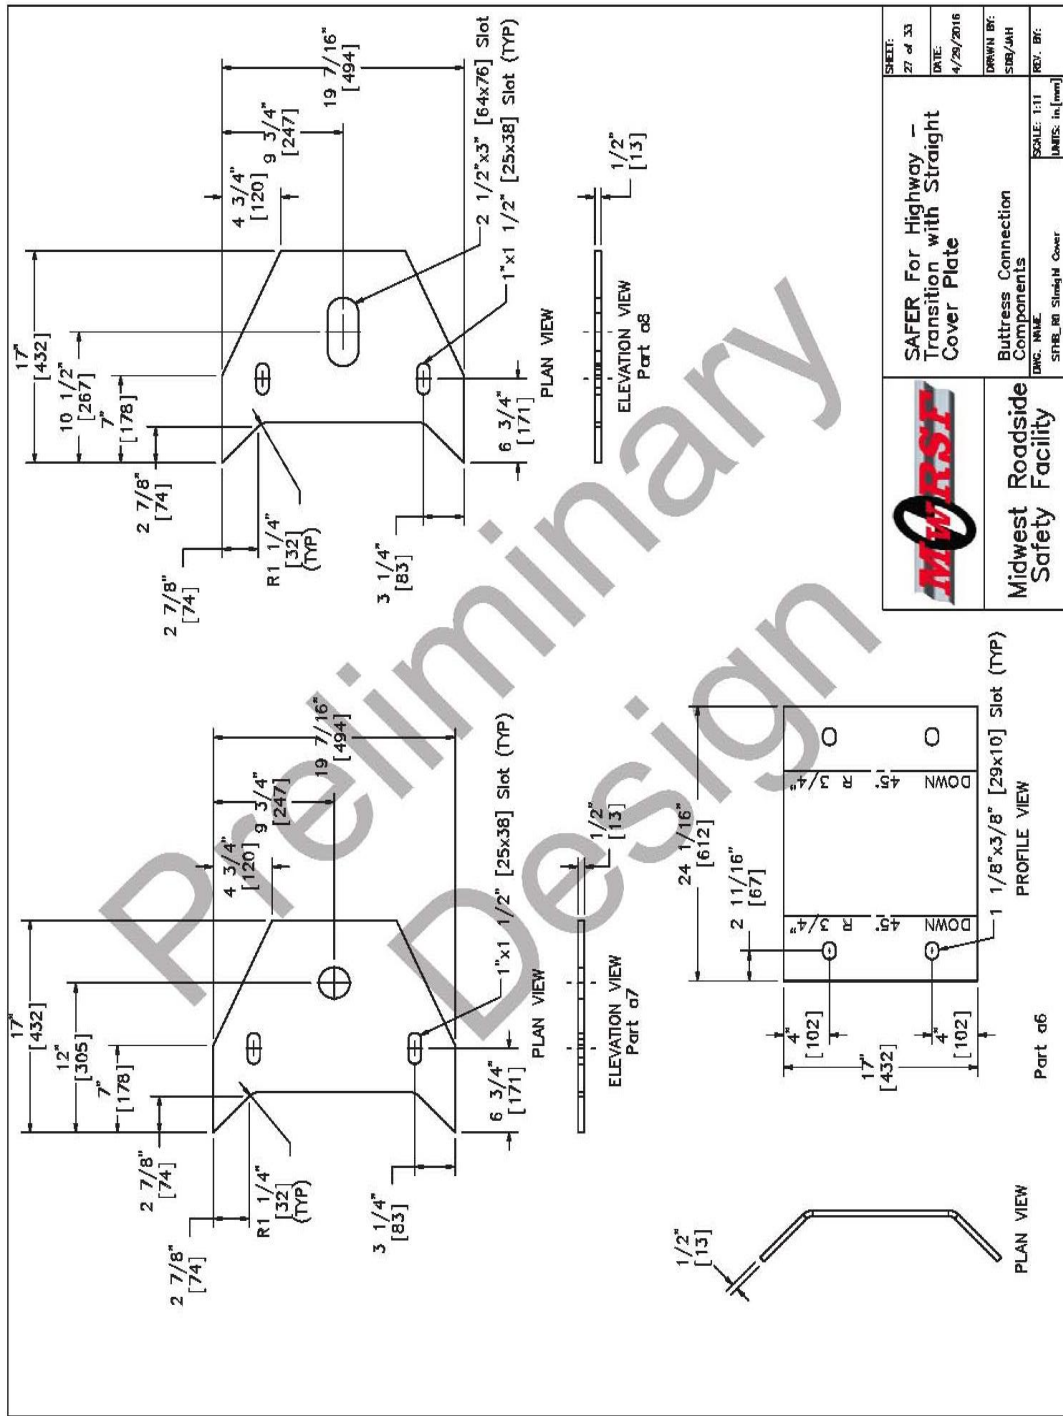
Buttruss Steel Rail Tube, Straight Cover Plate, RESTORE Barrier Transition
